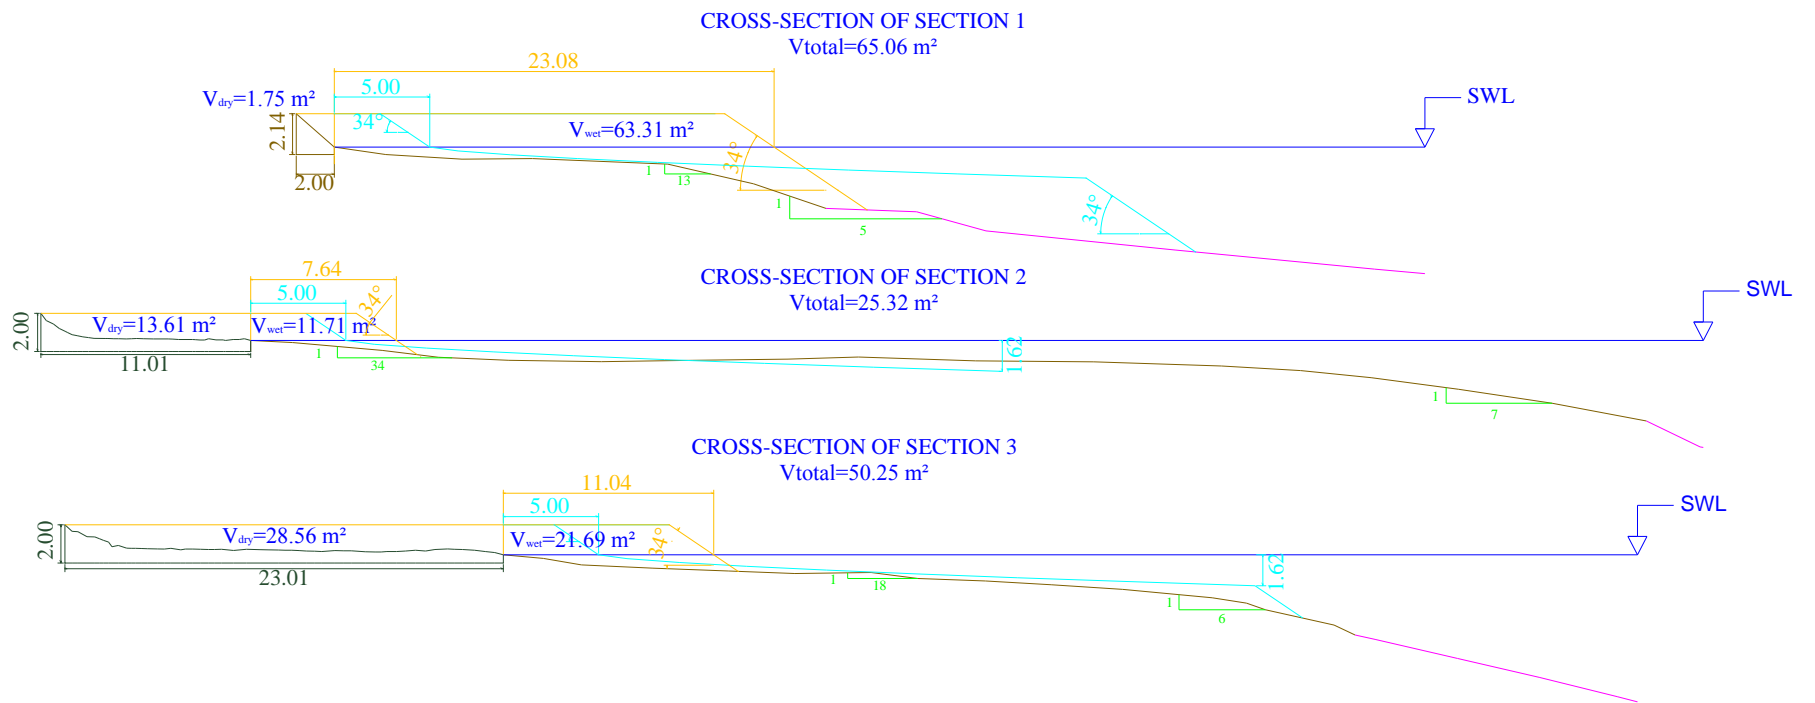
Design profiles of Section 1,2 and 3 for 5 m new dry beach width ($D_{\text{fill}}=0.45 \text{ mm}$).
